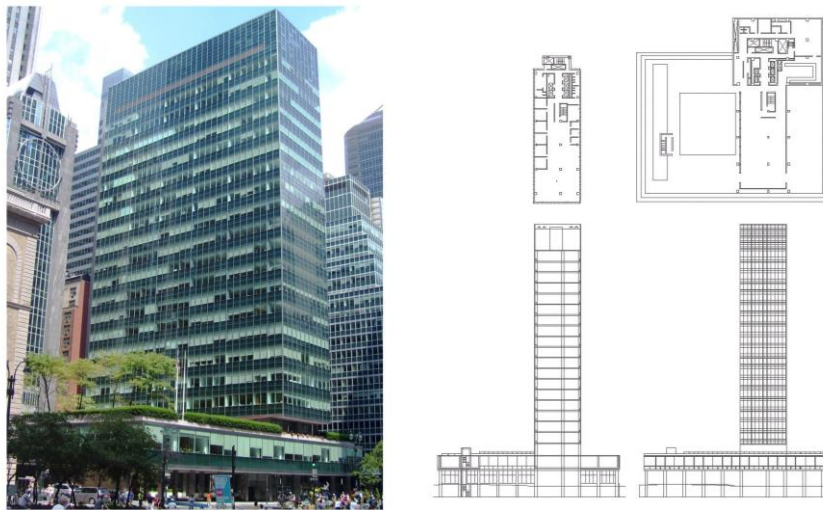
Lever House in NYC (Left) (Source: Wikimedia Commons). Lever House building plans and sections (Right) (Source: www.quondam.com/21/217ki01.gif.)
